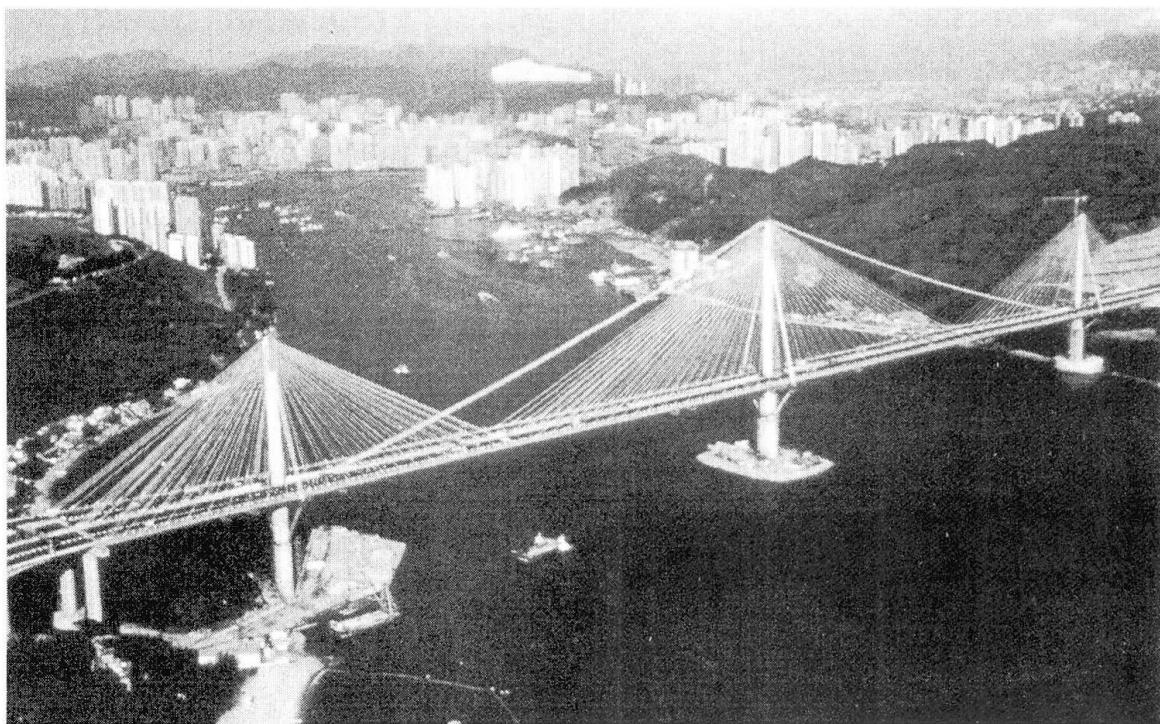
Ting Kau Bridge, Hong Kong, completed 1998
